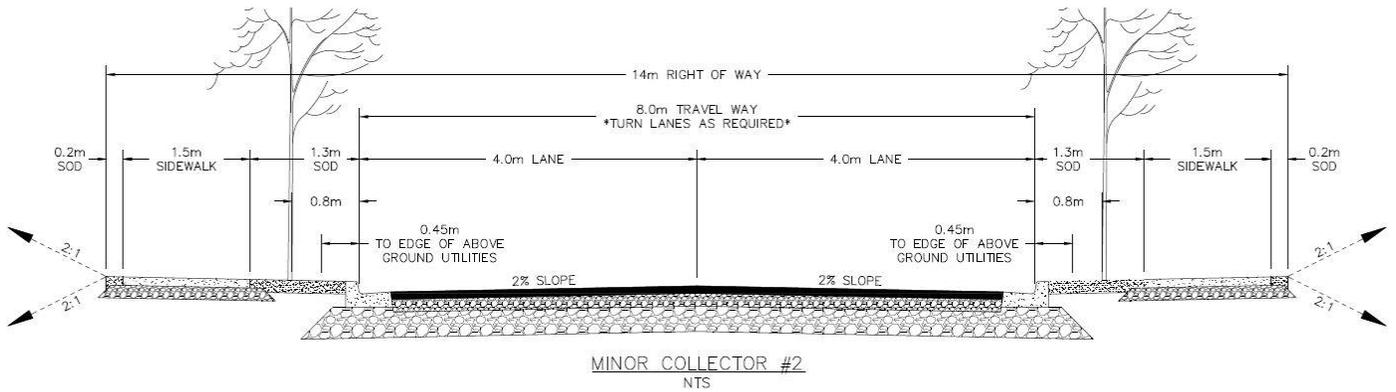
Proposed street cross sections for Minor Collector Roads 2. See Appendix B for larger image.
